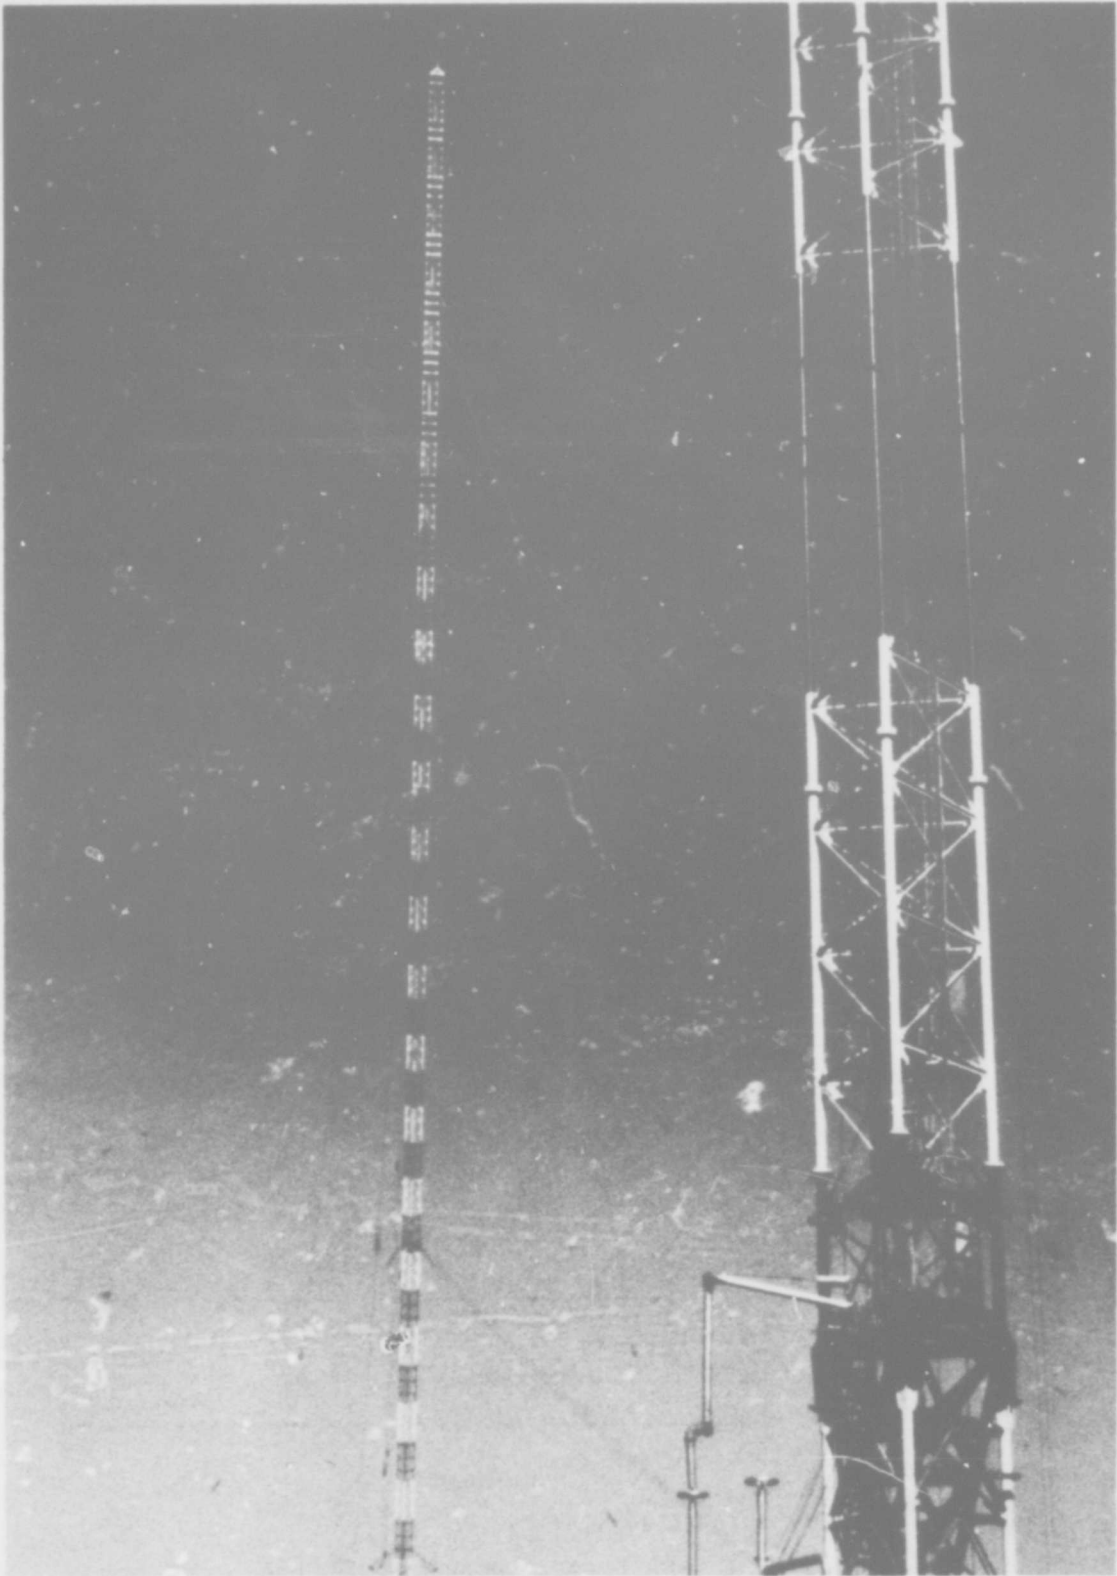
Lualualei 1,500-foot VLF guyed towers; east tower in foreground, west tower in background.
